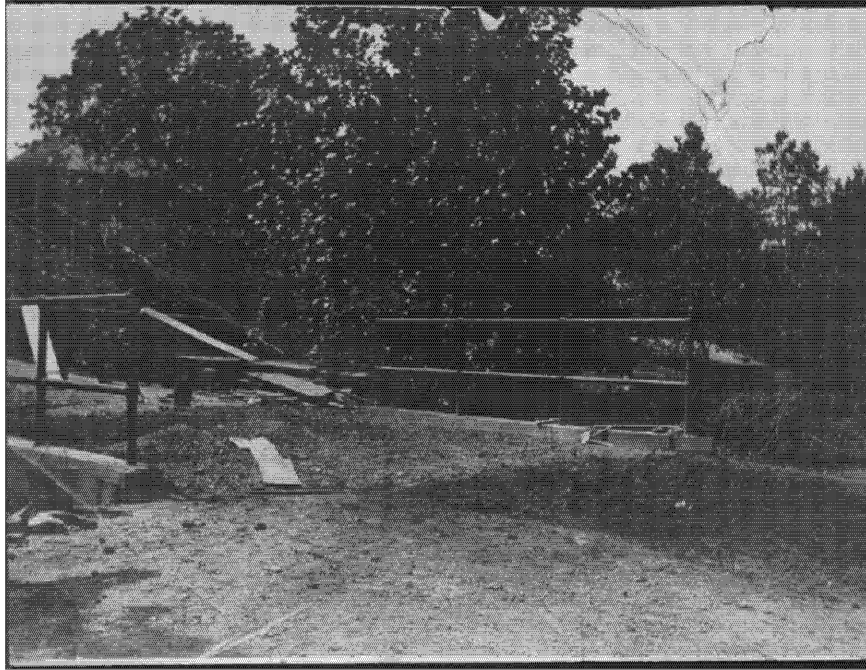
View of Gordon's Slough Bridge under construction, 1907.
